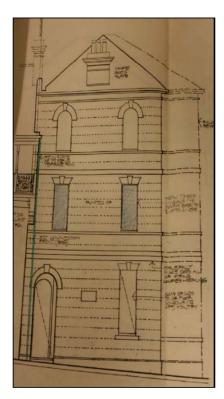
Ballast Point Road elevation as shown on the 1989 plans. New timber windows are indicated on the first floor.
